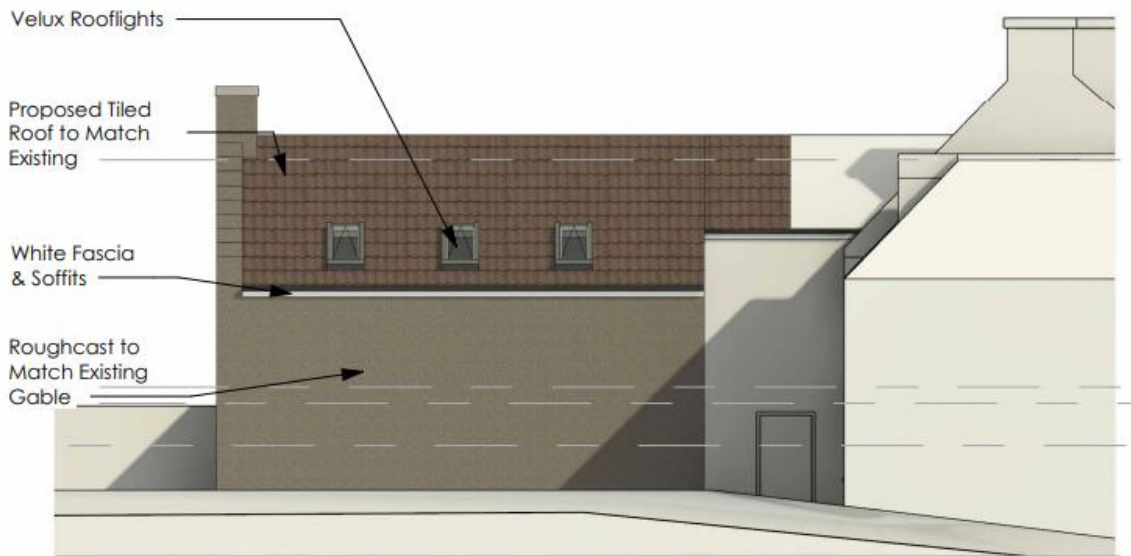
Side elevation of proposed extension demonstrating no adverse impact on amenity of adjacent window.
